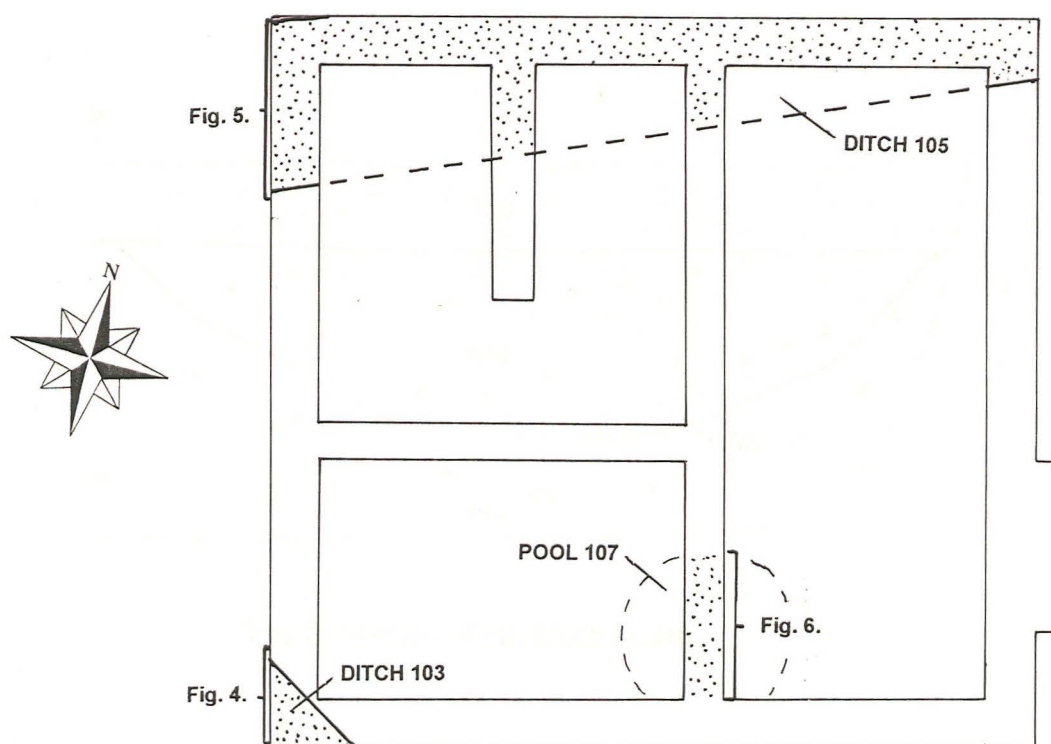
Plan of foundation trenches showing the location of the archaeological features (1:100).
